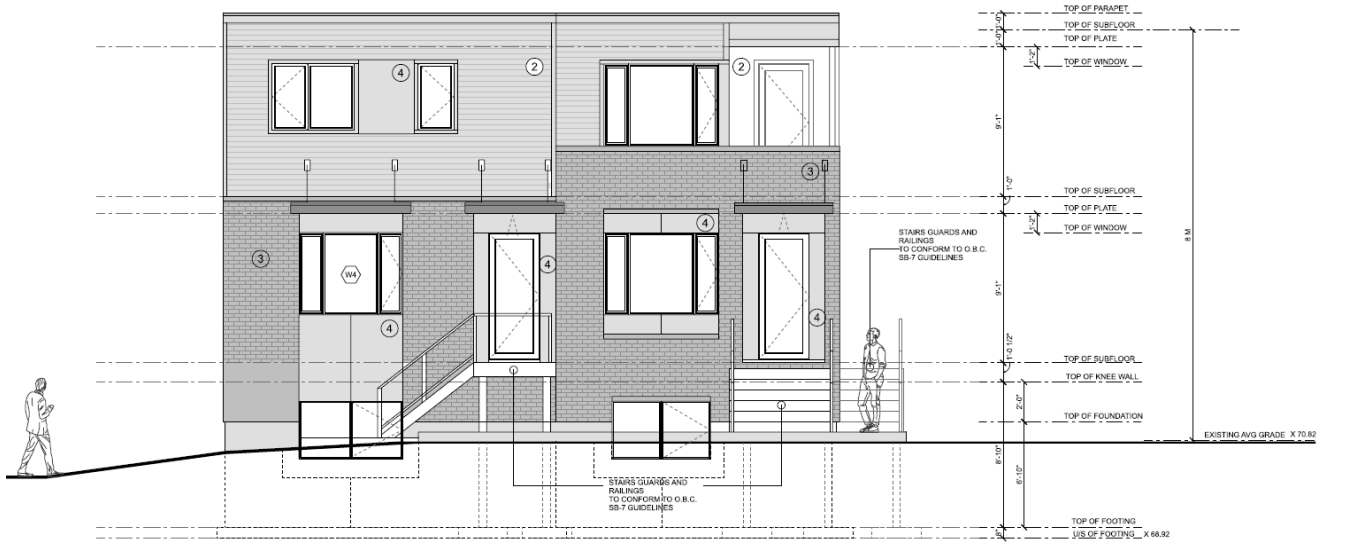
West Building Elevation (viewed from Roosevelt Avenue)
